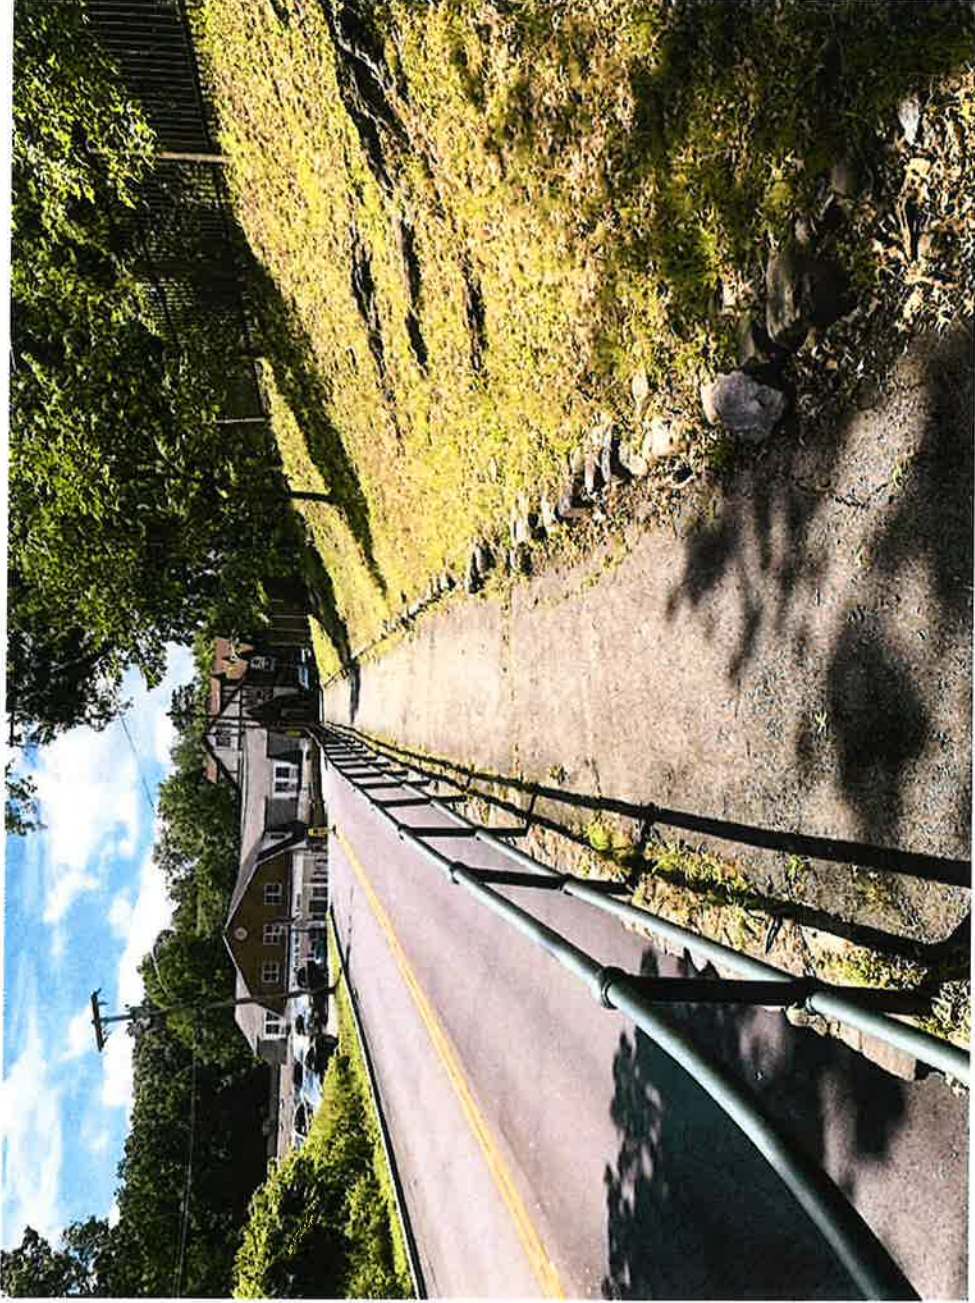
WALKWAY ON NORTH SIDE OF TRESTLE
